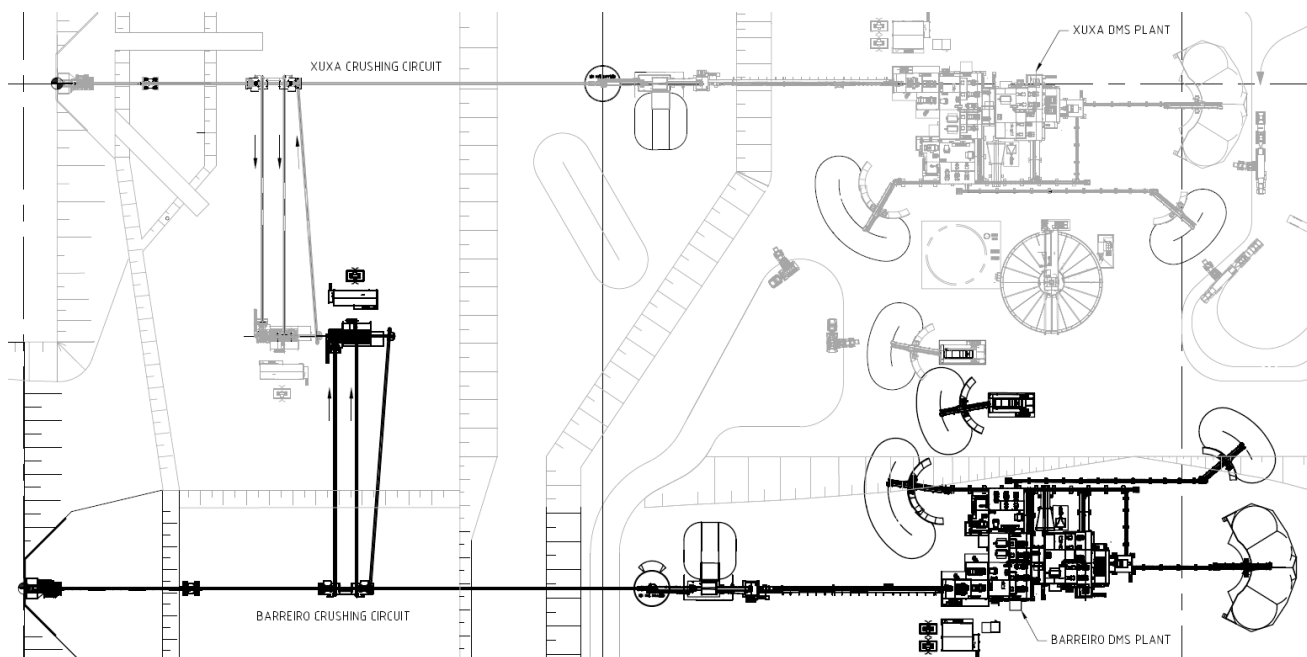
Xuxa and Barreiro Process Plant Layout (2021 Design)
